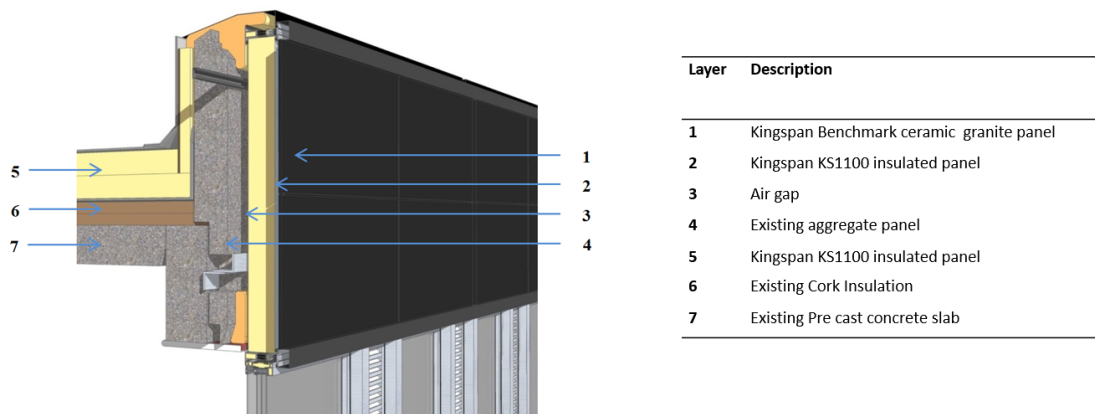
External retrofit opaque roof construction build up. (reproduced courtesy of Henry J Lyons Architects)
